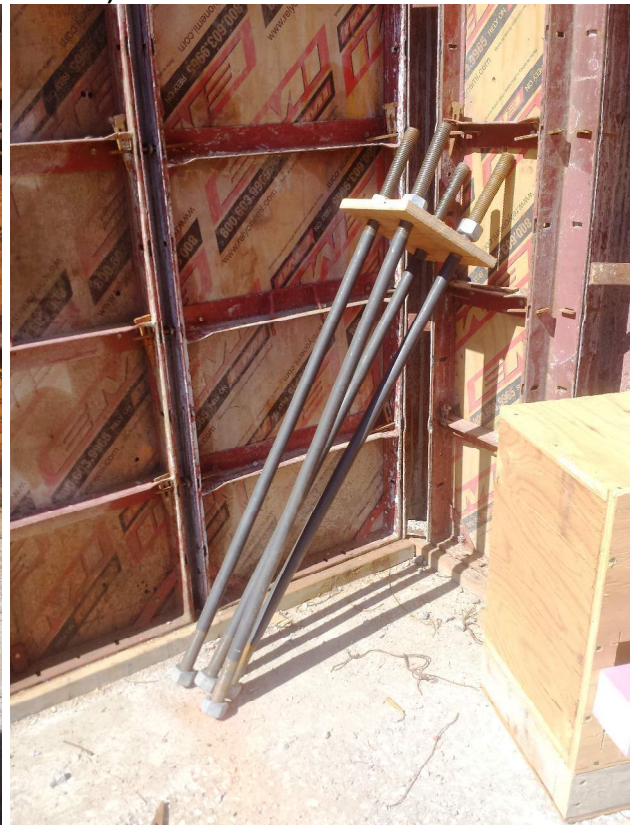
Wall & Pier Reinforcement 15/A to 12/A
